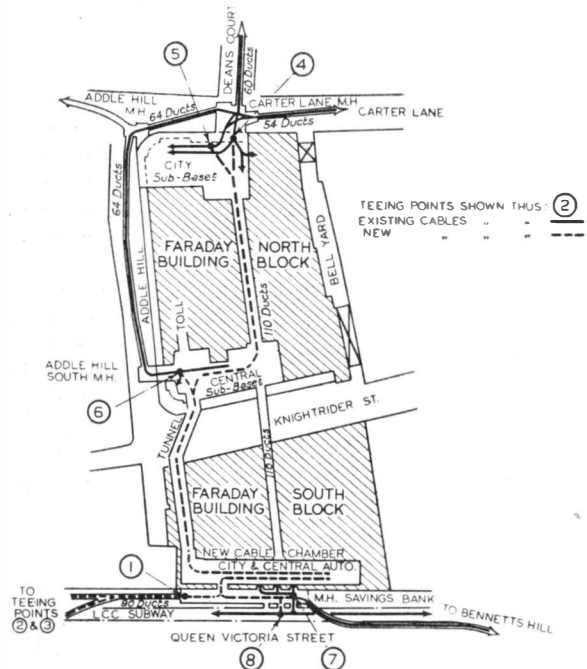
PLAN SHOWING CABLING ARRANGEMENTS.
